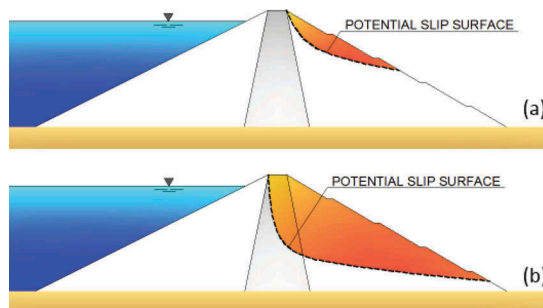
Potential failure surfaces in zoned dams: a) not crossing the core; b) extensively crossing the core.
